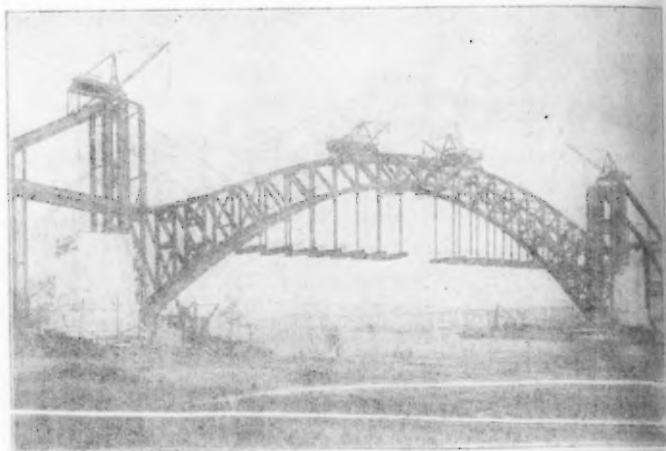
HELL GATE BRIDGE: ERECTION STAGE, NOVEMBER 1ST, 1915.
